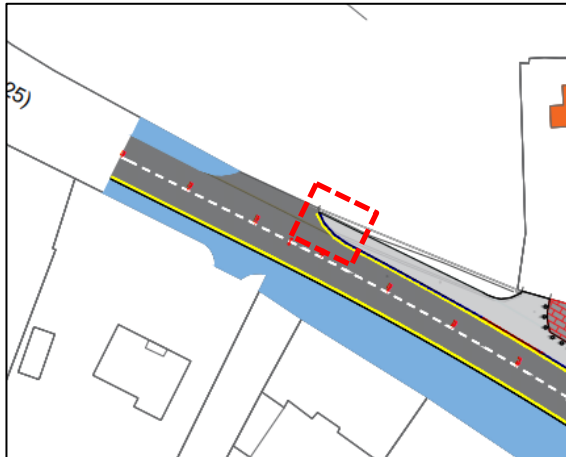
New footway with no tactile paving (Dwg. No. 11199-3-005)
